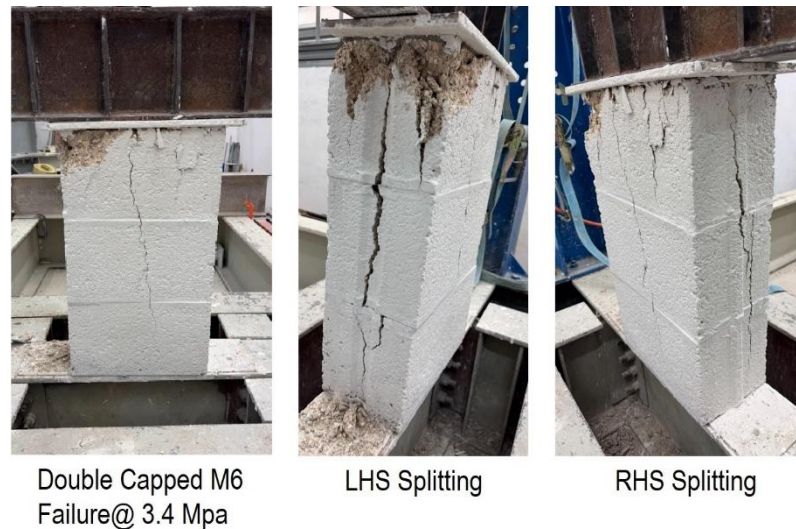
Images of Double Capped Mortar Shell Bedded Wallette Failure
